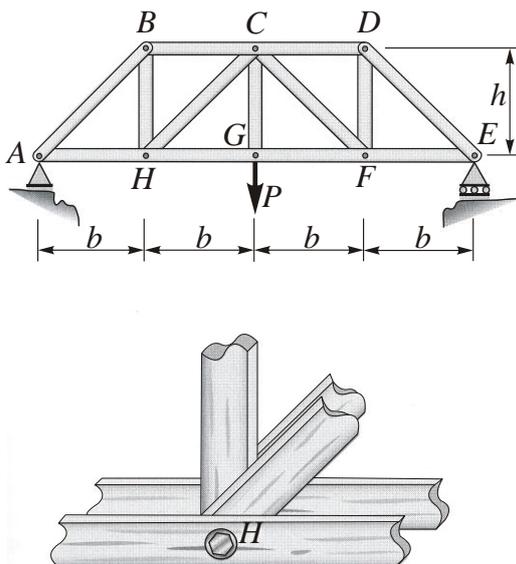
The truss $ABCDEFGH$ is part of a wood bridge. The truss members are hinged
